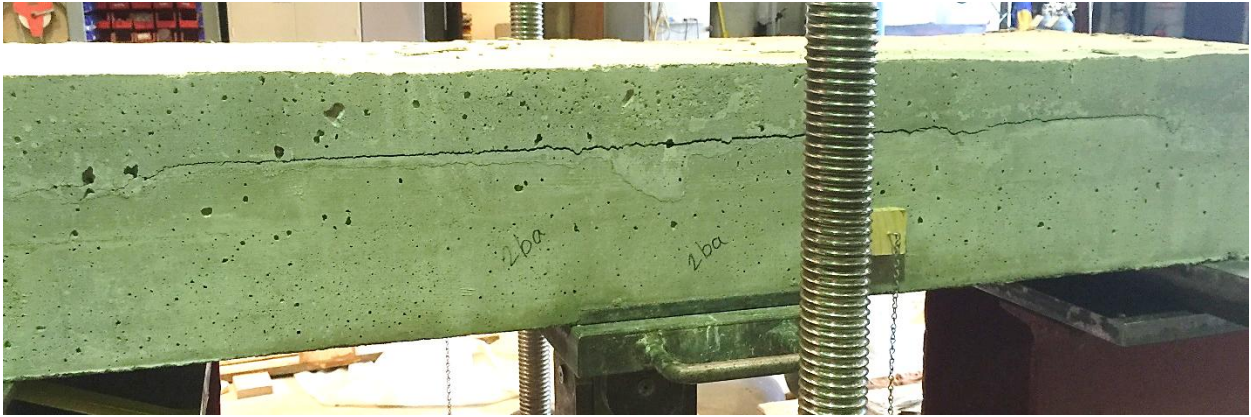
Case 2 positive bending flexural test specimen failure at concrete bond interface
